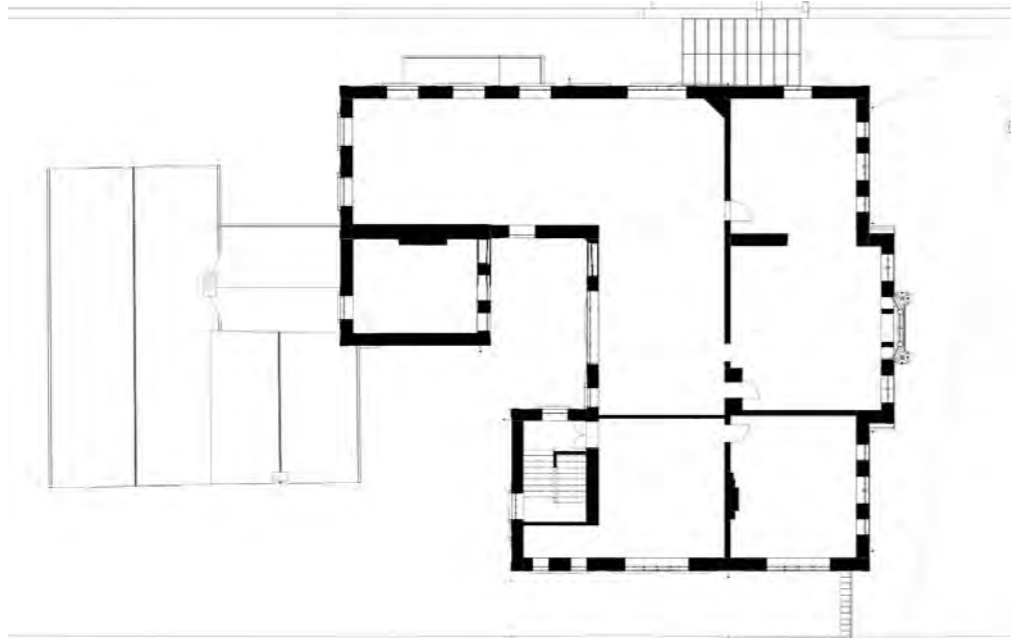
Author's Own. 2024. Empty First Floor Plan.
